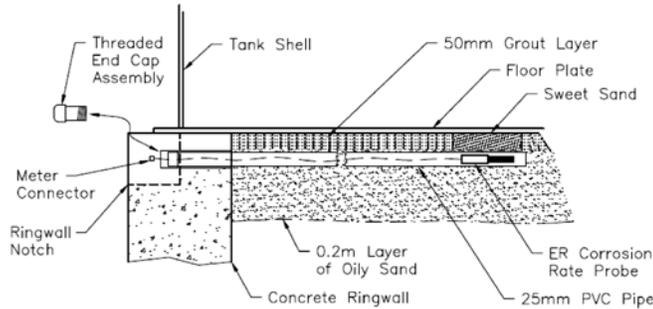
Typical ER probe installation with grout removed above probe location<sup>2</sup>
